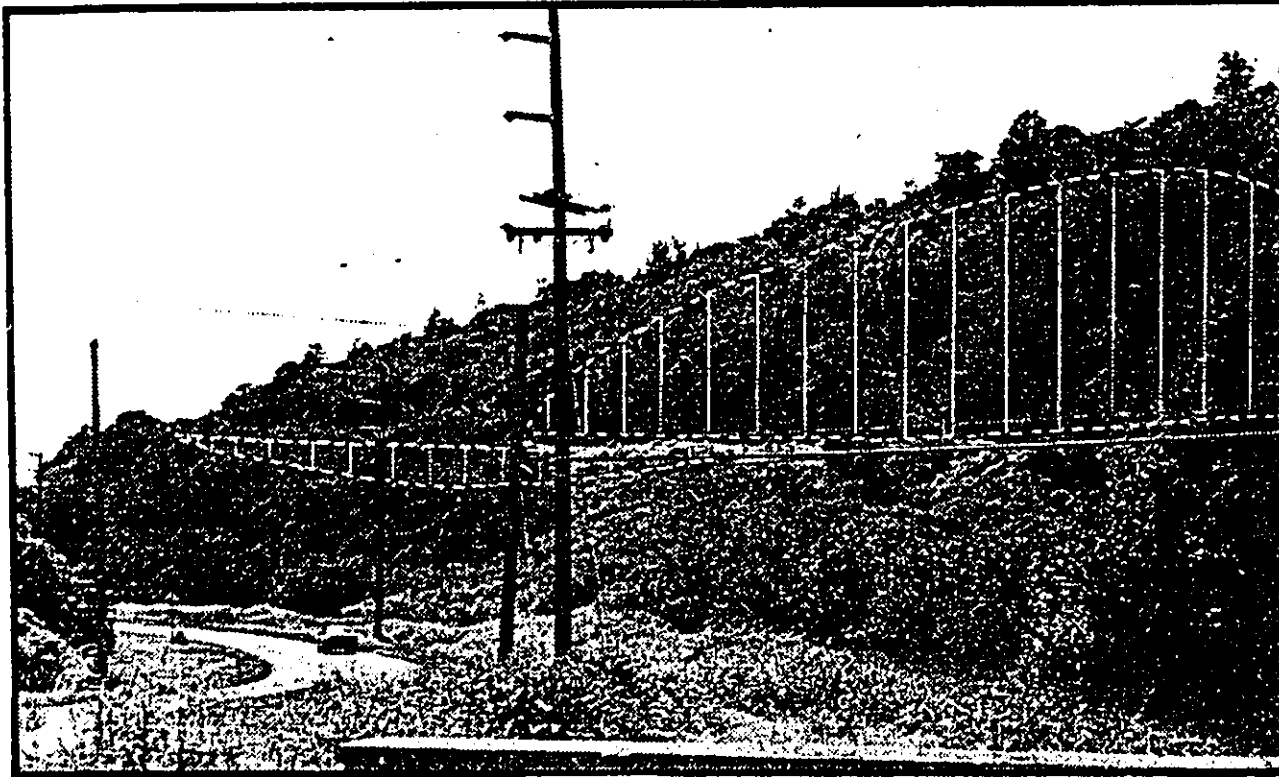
Approximate cut and fill on the Hanalei River Bluff from Alternatives A or W₂. (View from the bridge).
